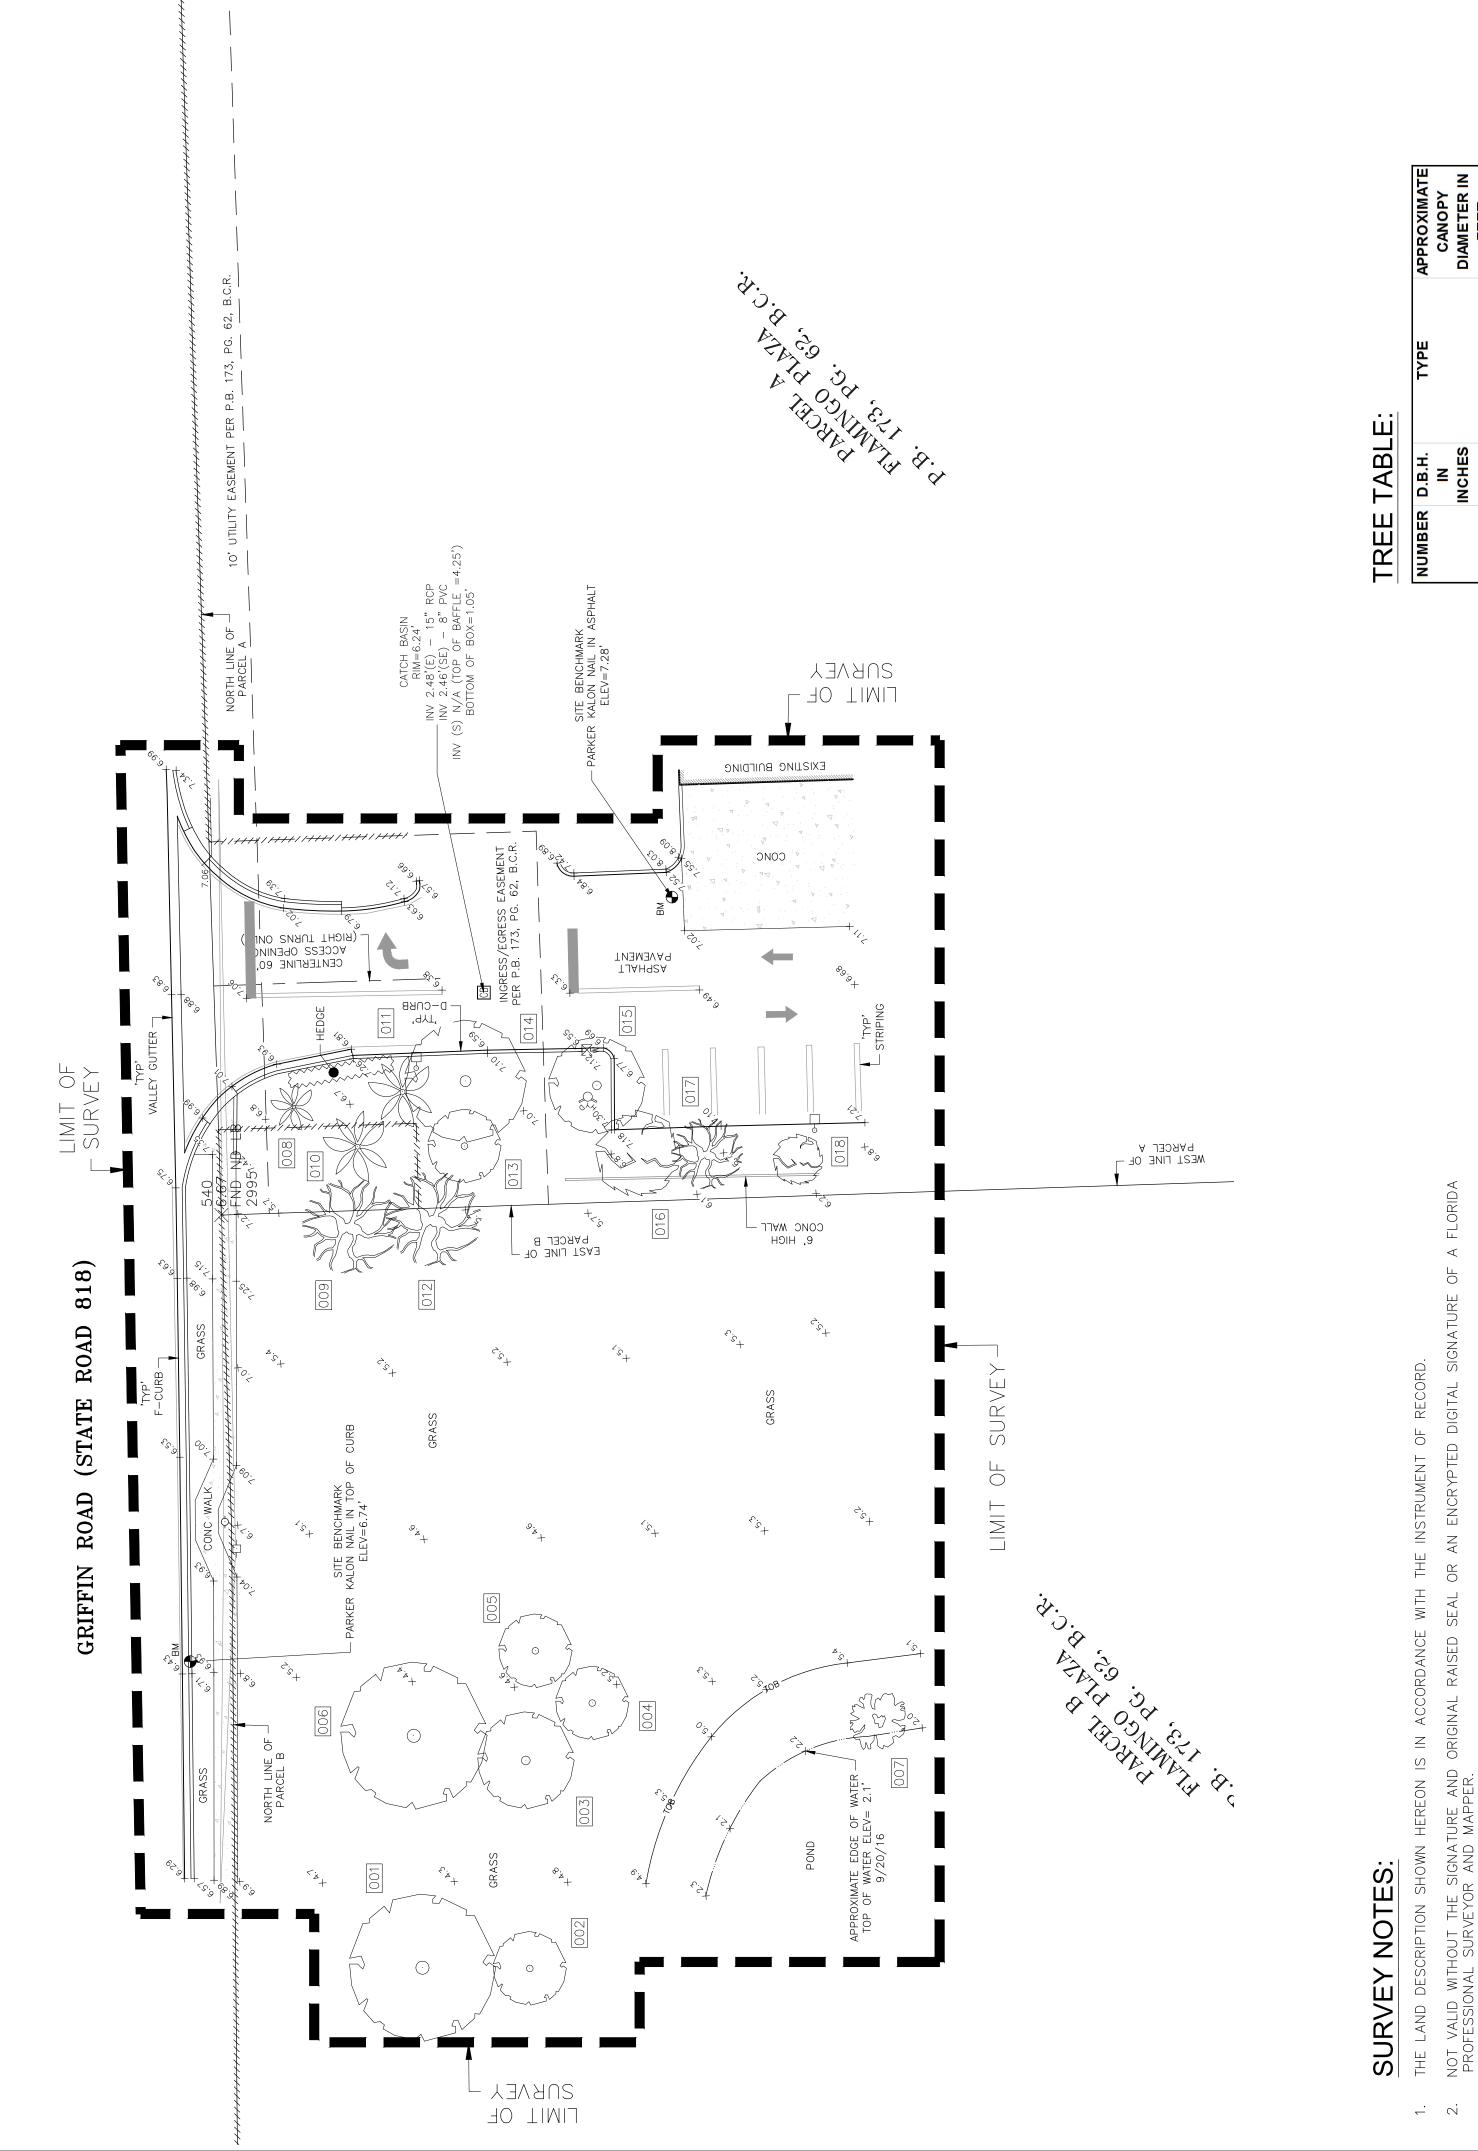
EXHIBIT "B" - FOUNDER'S TRAILSIDE PARK CONSTRUCTION PLANS
